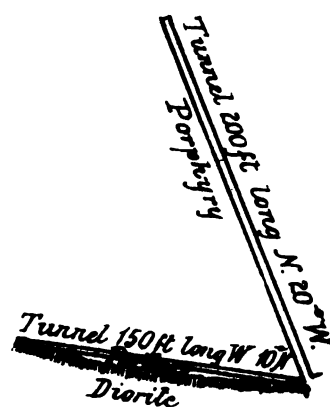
Plan (Scale 100 ft. to 1 Inch)
